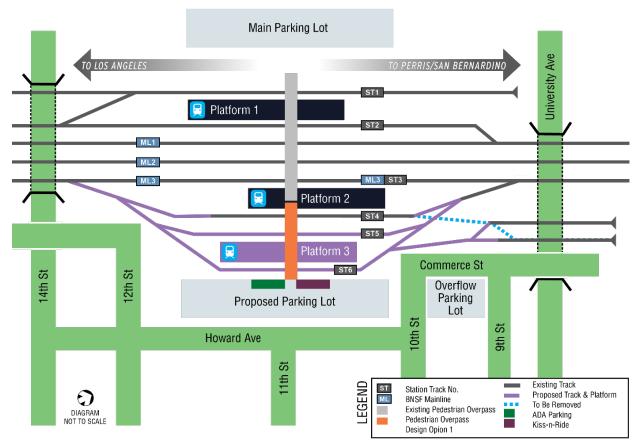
Build Alternative with Pedestrian Overpass Access Design Option 1
